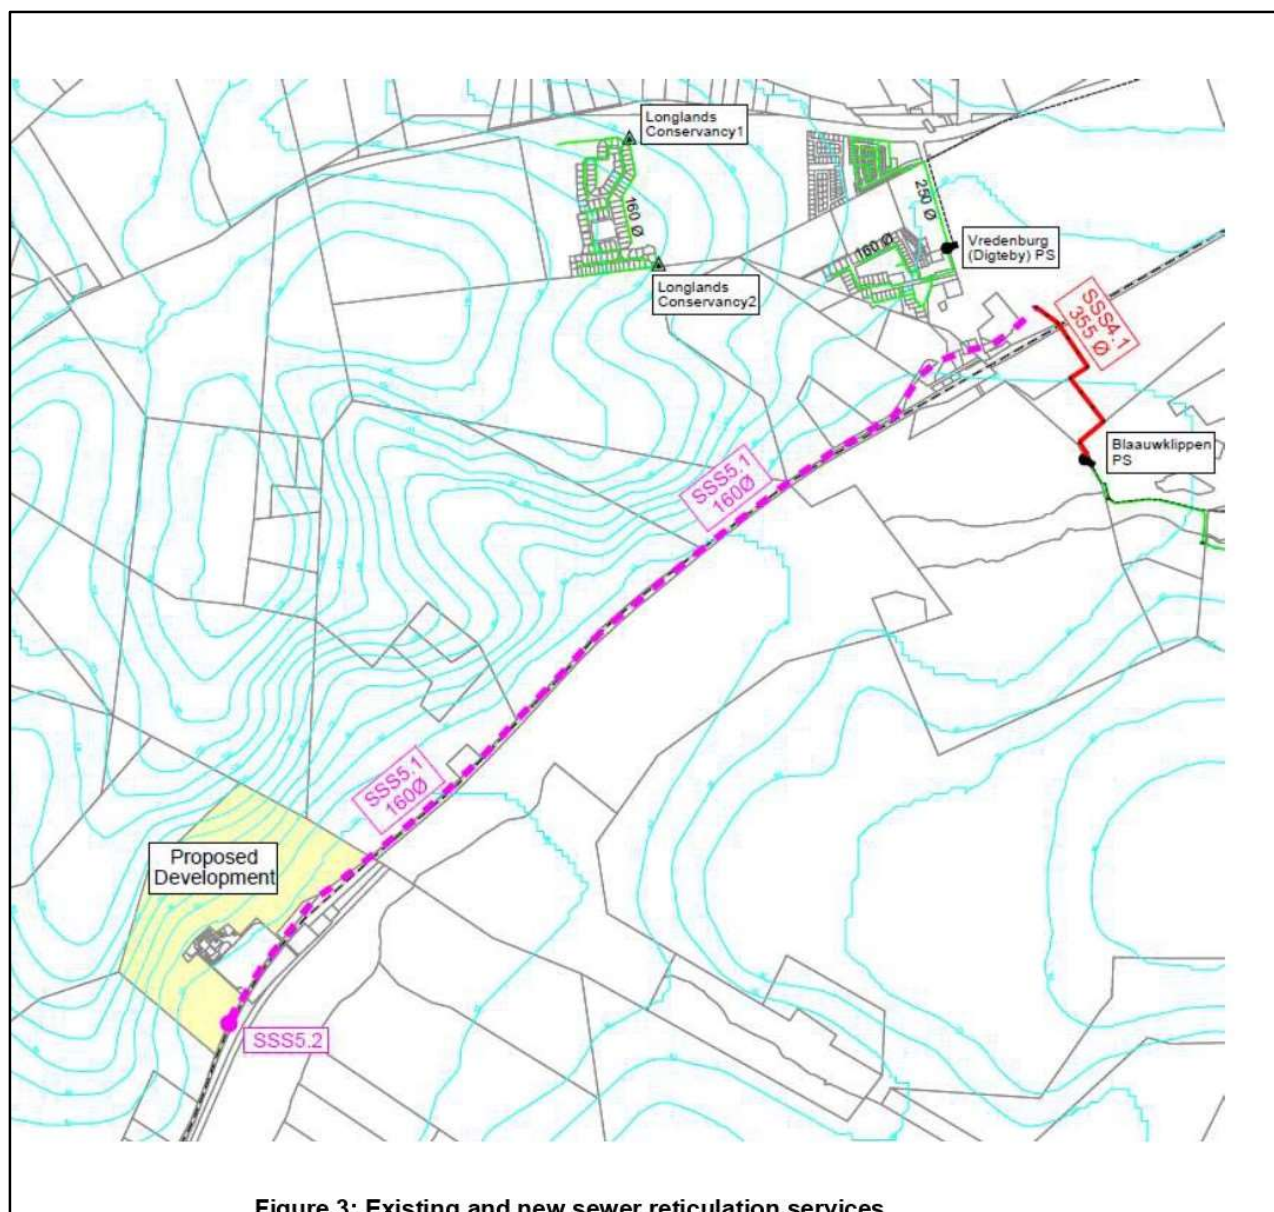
Existing and proposed sewerage reticulation (Courtesy of UDS Africa, 2023). The purple line indicates the alignment of the proposed sewerage pipeline.
